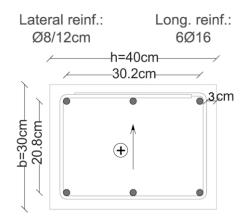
The cross-section of the non-strengthened column with the notation of the positive drift direction
